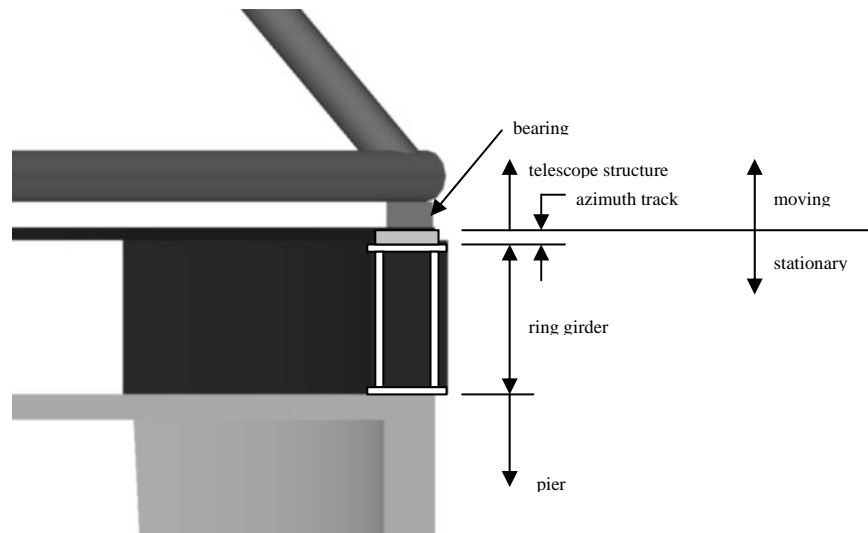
Connection of the telescope frame to the pier building detail (Michael Gedig, EDS).
